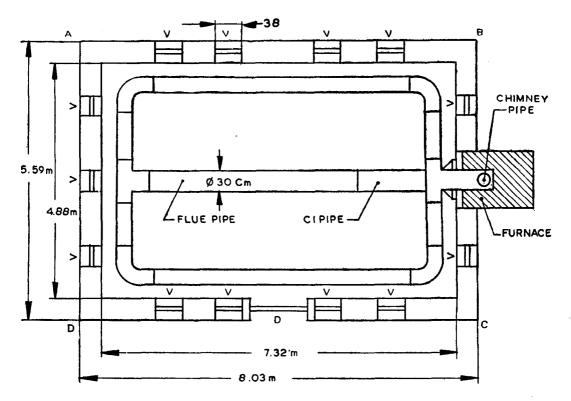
Ground Plan with Flue Pipe Arrangement (Karnataka Barn)
